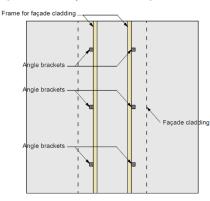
Example of statically indeterminate fixing for the anchorage
